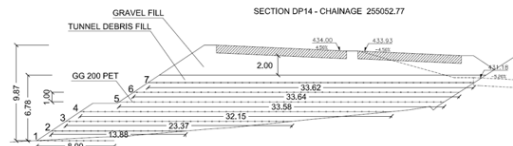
Design layout for the 9.87 m high geogrid reinforced embankment
